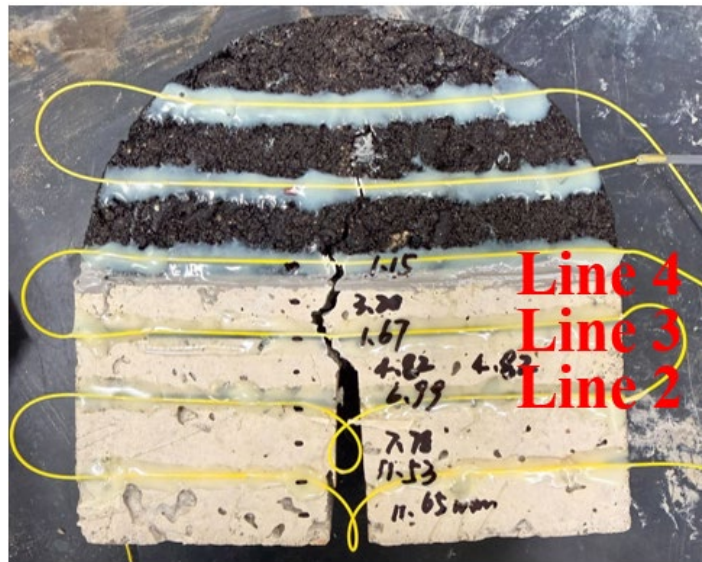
Post-test fracture pattern of the semi-cylindrical asphalt-overlaid PCC specimen following three-point bending
